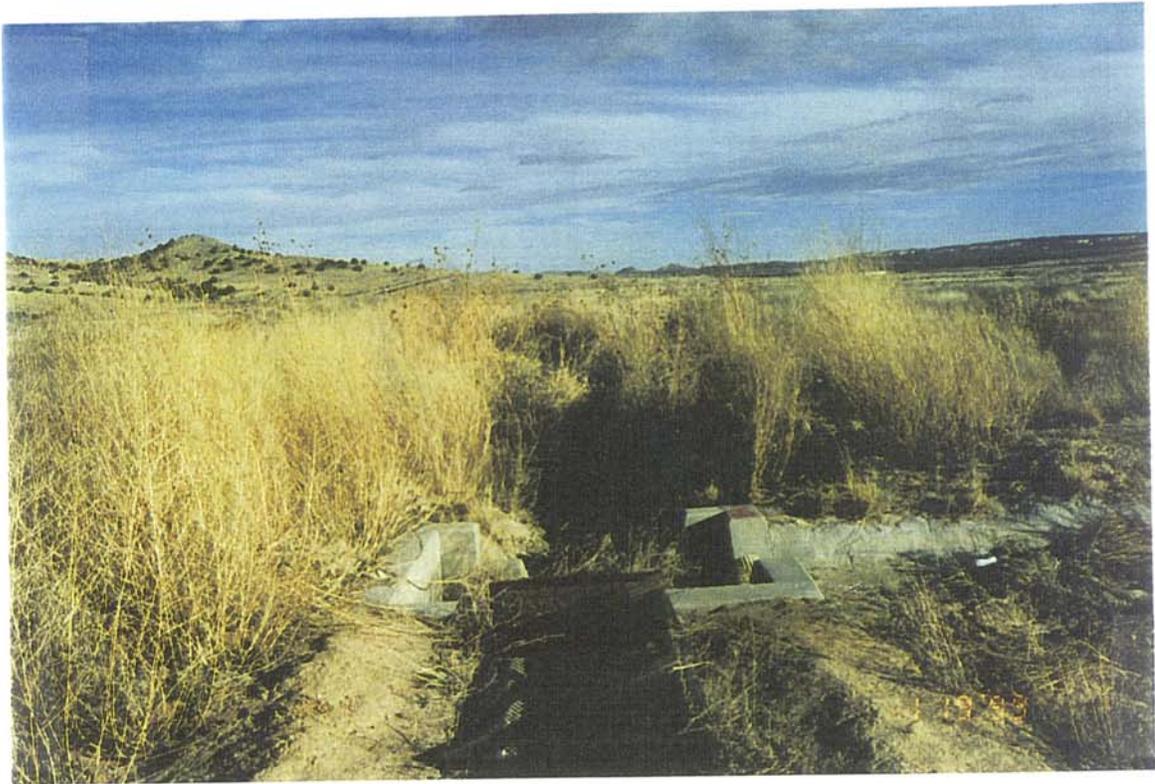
Seama Ditch (Laguna Pueblo). Stilling basin at the end of a flume and transition to an earthen ditch. Earthen ditch has heavy vegetation growth that retards flow. Ditch should be cleaned and reshaped.
